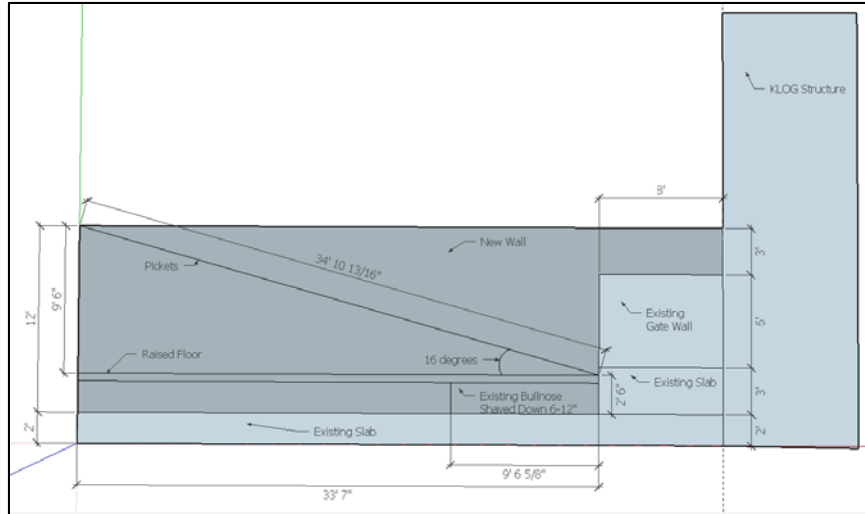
Side view of features on the downstream side of KLOG with raised side walls, a raised floor, a reduced-elevation concrete bullnose remaining and a picket weir at the base of the existing gate walls.
